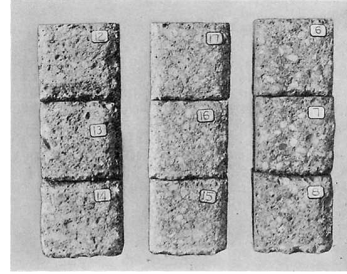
Concrete blocks after test [Abrams (1916)]
